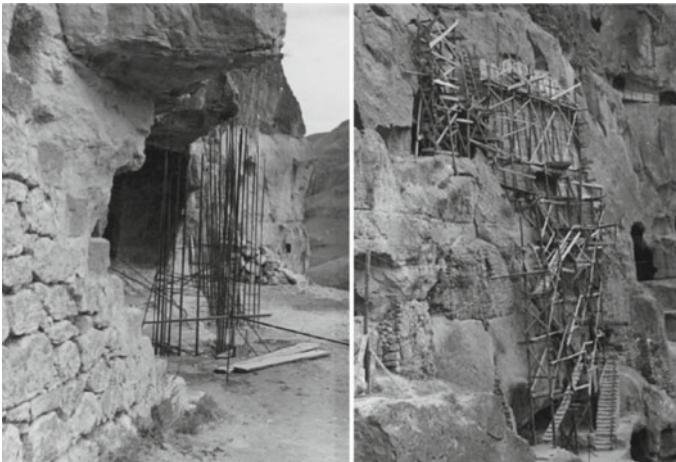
Past mitigation measures, reinforced concrete wall and wooden scaffolding (1960–1973)
